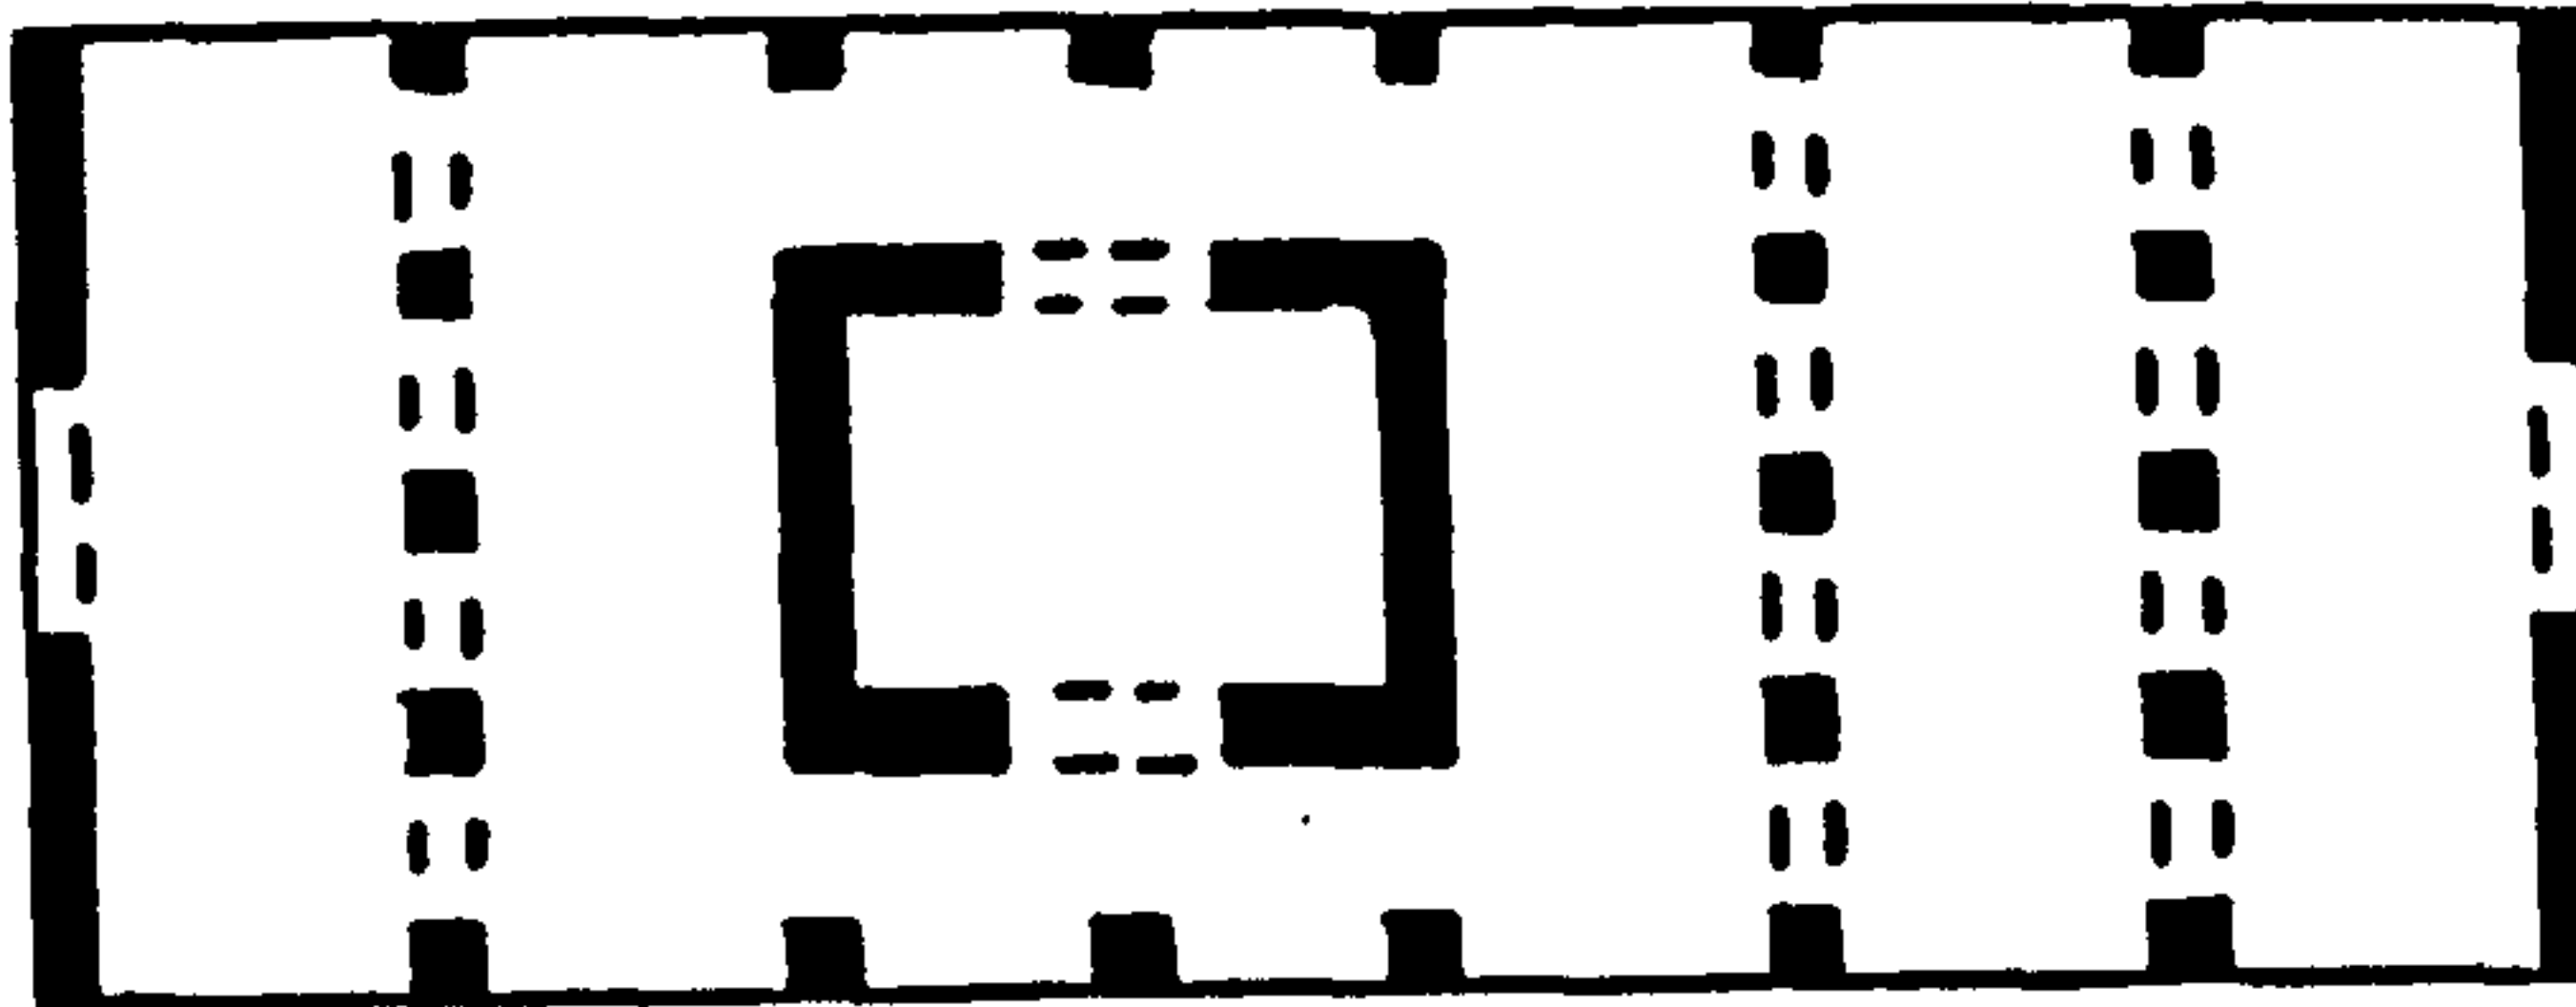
(c) Typical layout of a high-rise building with coupled shear wall-core-frame interaction
